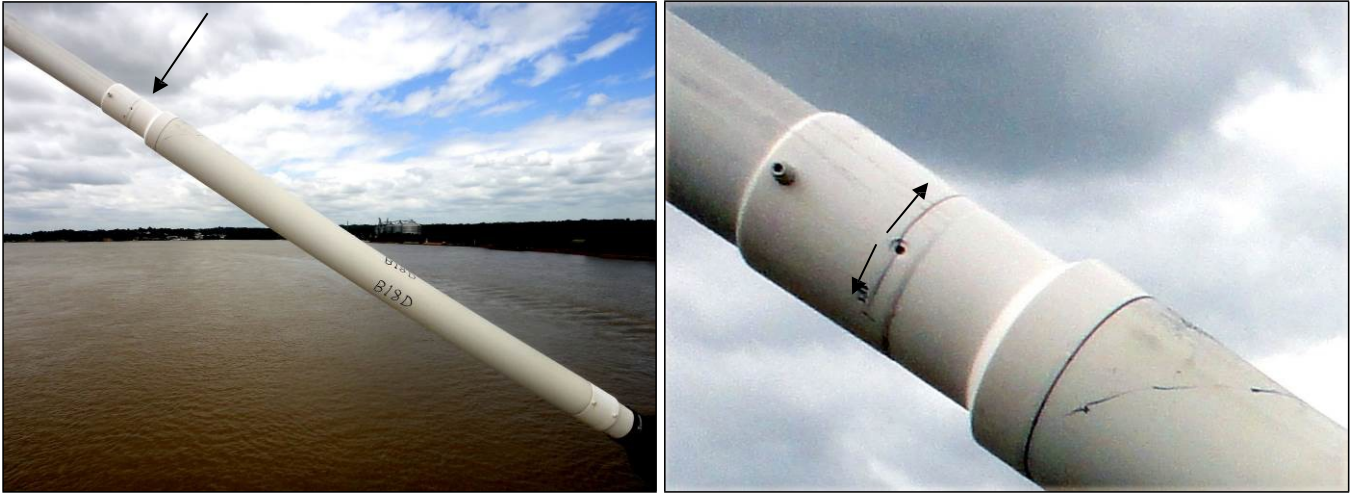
B18D: Reducer Crack at Hole (90°) for Electro Fusion Weld
